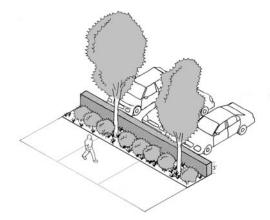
(A)(2)(a). Parking lot planting buffer with low wall.
